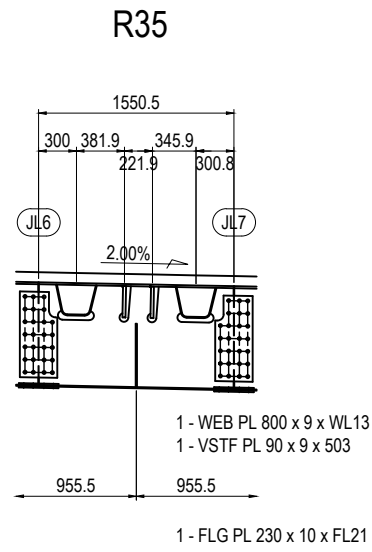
DETAIL OF CROSS BEAM SECTION (18) S=1:60
